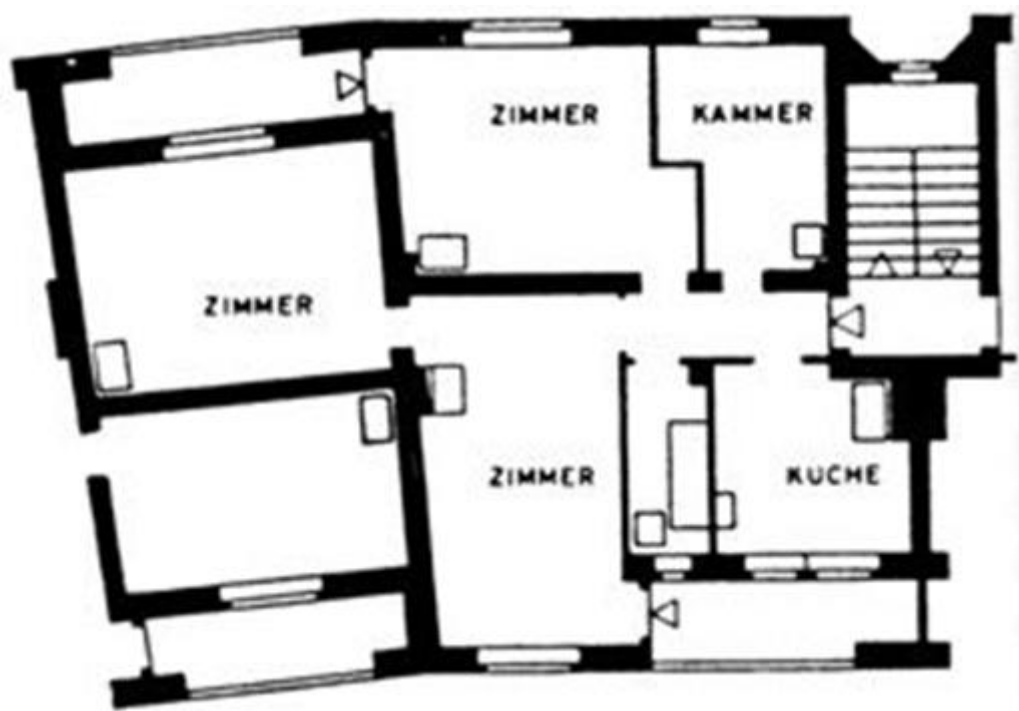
Typical plan of “horseshoe” block, Britz Housing (1925)
